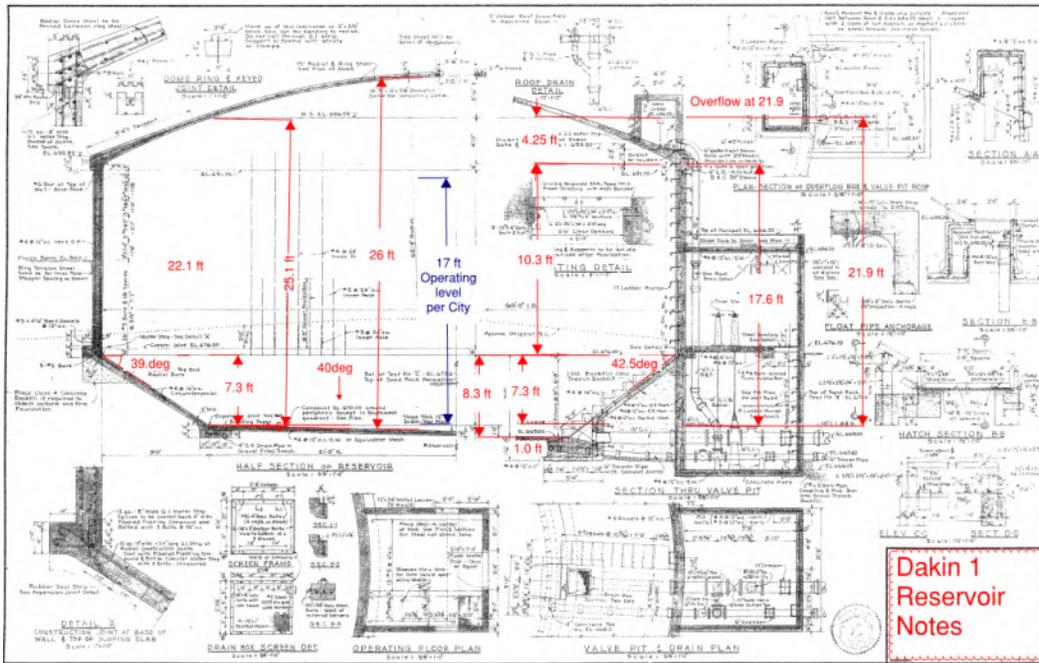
Dakin 1 Reservoir Sections and Details – Assumed Reference Drawings
